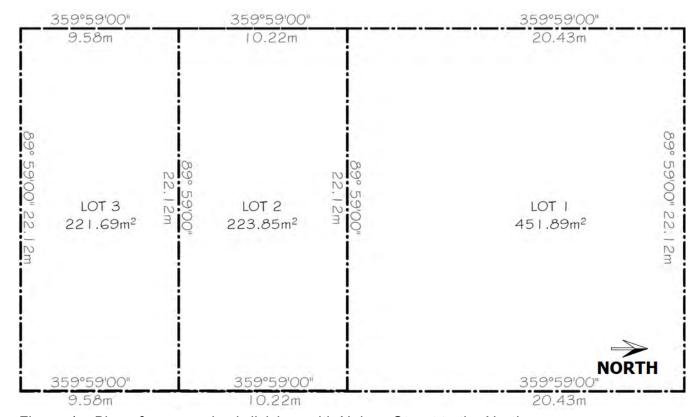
Plan of proposed subdivision, with Nelson Street to the North
